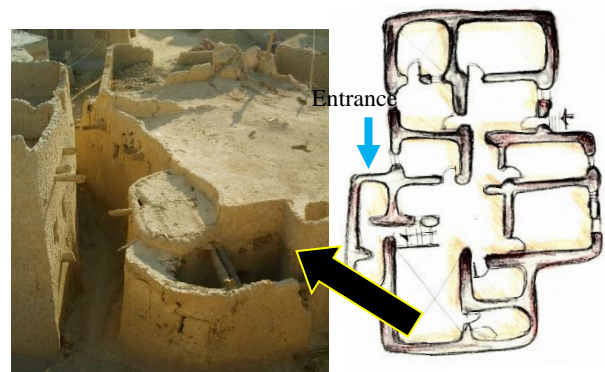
A typical dwelling built using the traditional techniques and Kershef blocks. The dwelling is comprised of an area outside the house for men. The entrance hall consists of three rooms: the guest room, storage and an unroofed kitchen which leads to a backyard fold. Bedrooms are located at the back, away from guests for privacy purposes.
